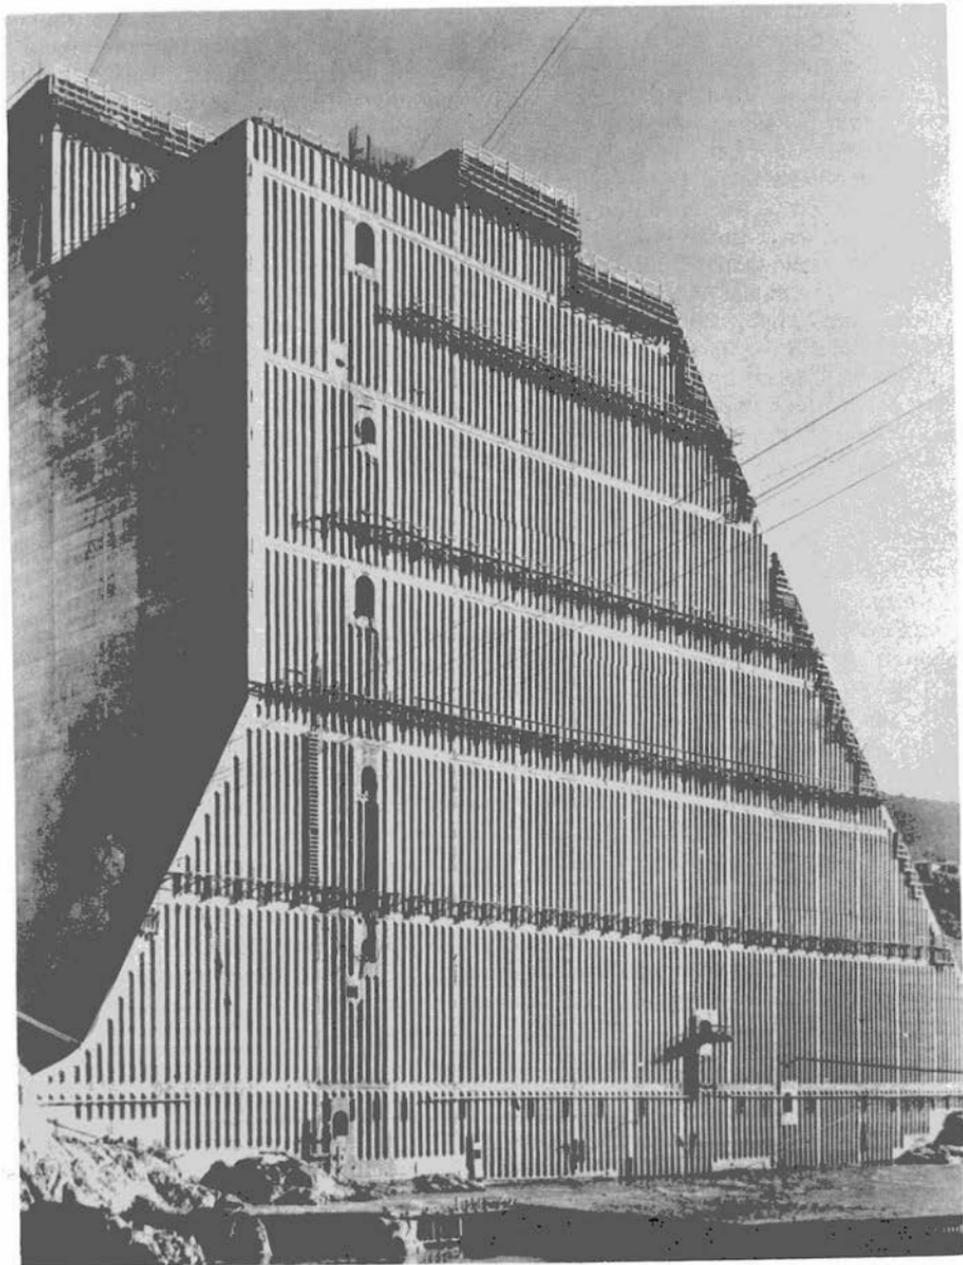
Face of Joint in Shasta Dam Showing Keys,
